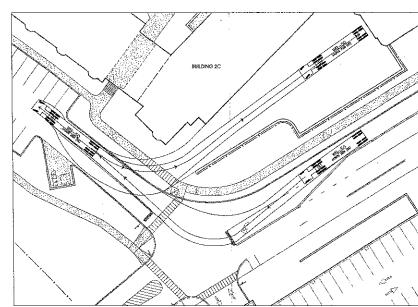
BUILDING 2C LOADING DOCK ACCESS (WB-50)
